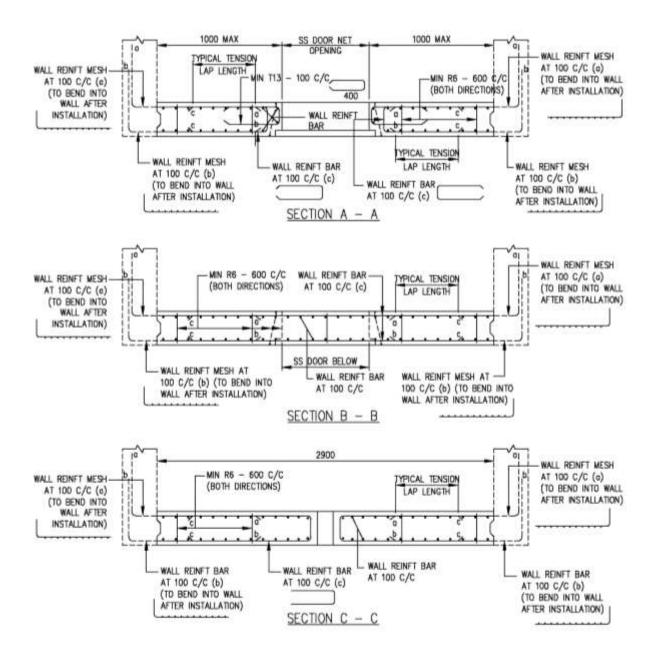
PLAN OF PRECAST HS, SS or SSS DOOR FRAME (TYPE 3)
